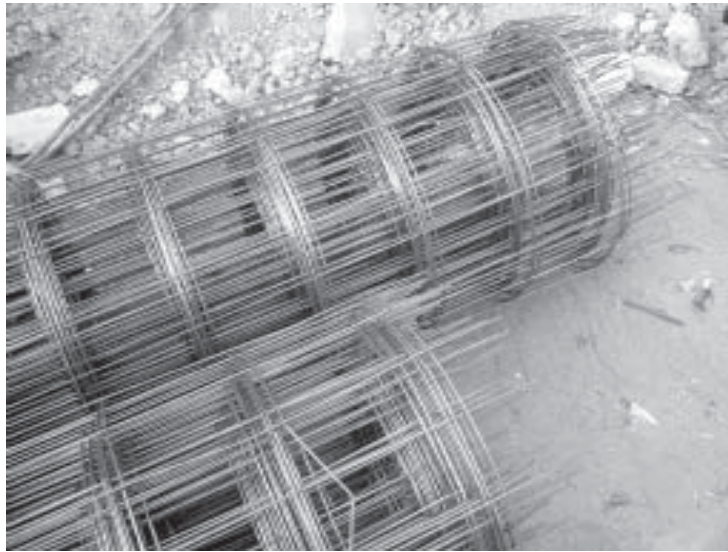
The image shows WWF used in construction applications today. The square size can be made in many different dimensions. More wire surface in contact with the concrete can create better bonding in building components to avoid concrete fragments breaking off in an explosion.
